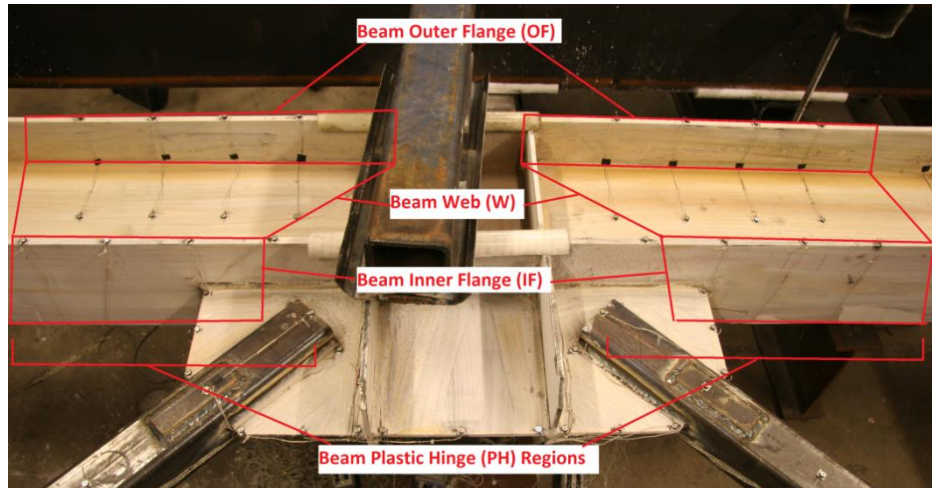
Nomenclature for beam damage locations (Terpstra 2017)
